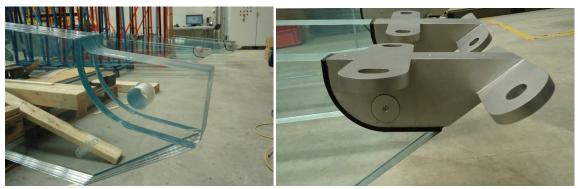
front connection point between the glass fin – roof glass - fascia panel
